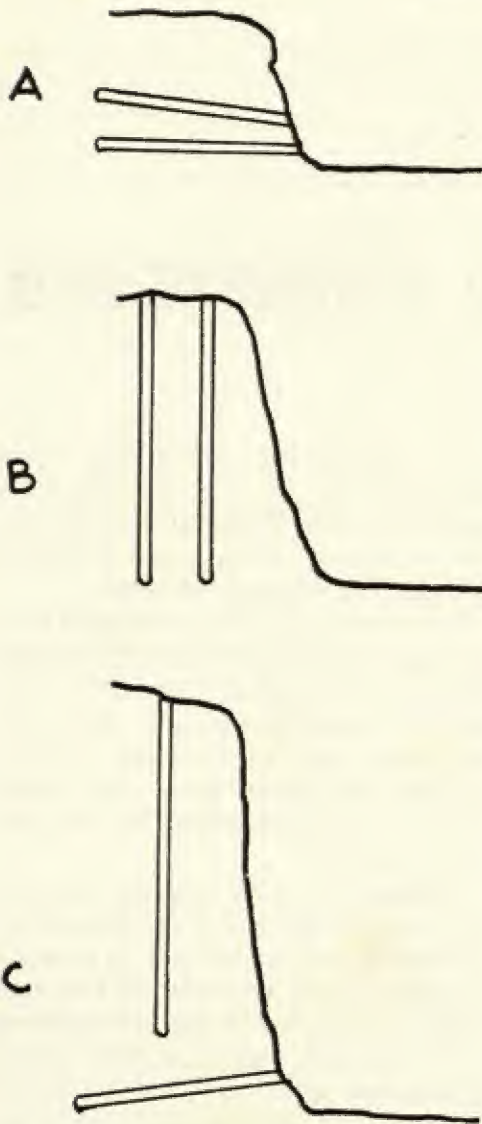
Horizontal and vertical drill holes commonly drilled, it is necessary to start them several feet above the deposit, or to start them at a slight upward slant. Spacing may be ten to thirty feet.
